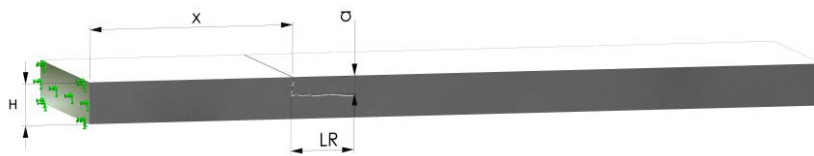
A zoom on a steel beam having an L-shaped crack oriented to the right L_R
